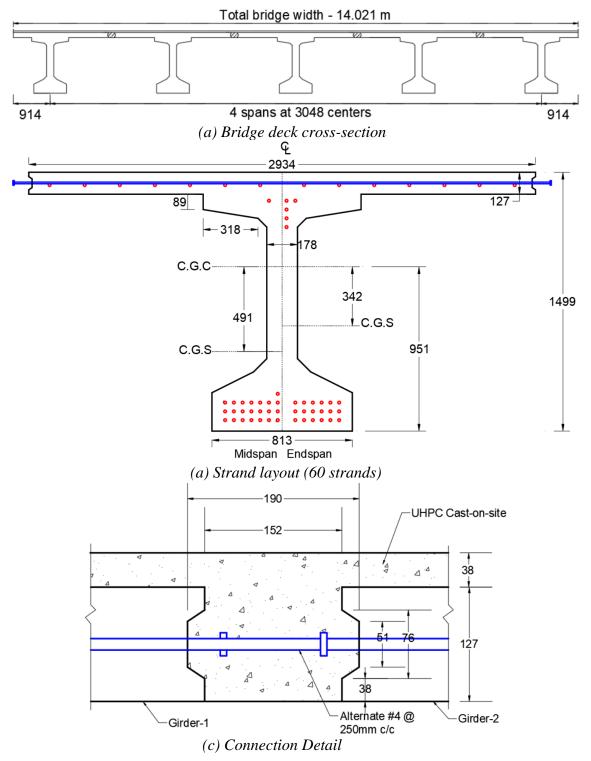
Strand layout and connection detail for Design 5: 5-Tx54-UHPC-Girders with 5-inch wide flange, 1.5-inch site-cast UHPC topping
